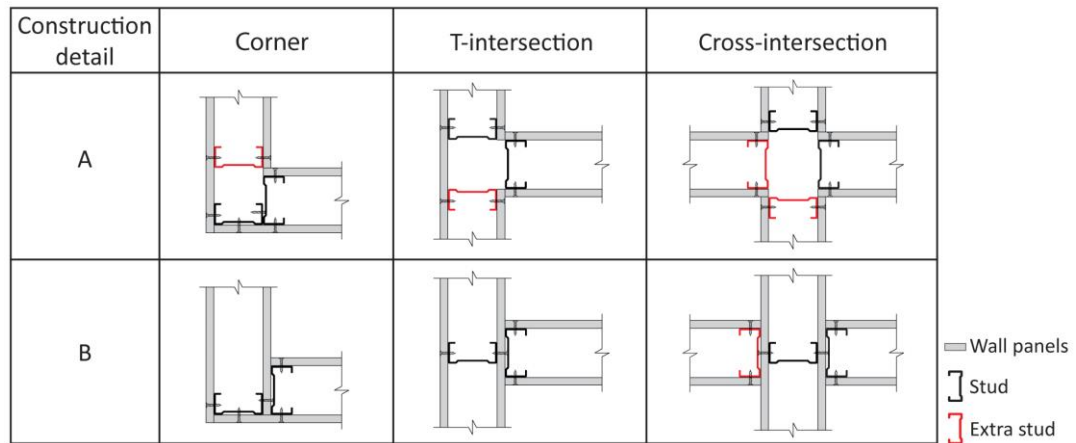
Two possible details at intersections and corners of a light-gauge steel framing system.
